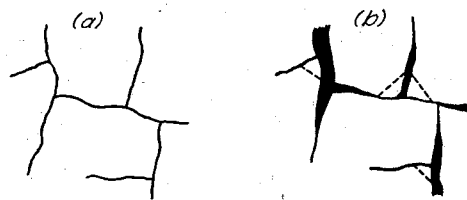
Section through fissured stiff clay mass. (a) Old fissures closed before relief of stress by excavation. (b) Relief of stress causes fissures to open, whereupon circulating water softens clay adjoining the walls.
